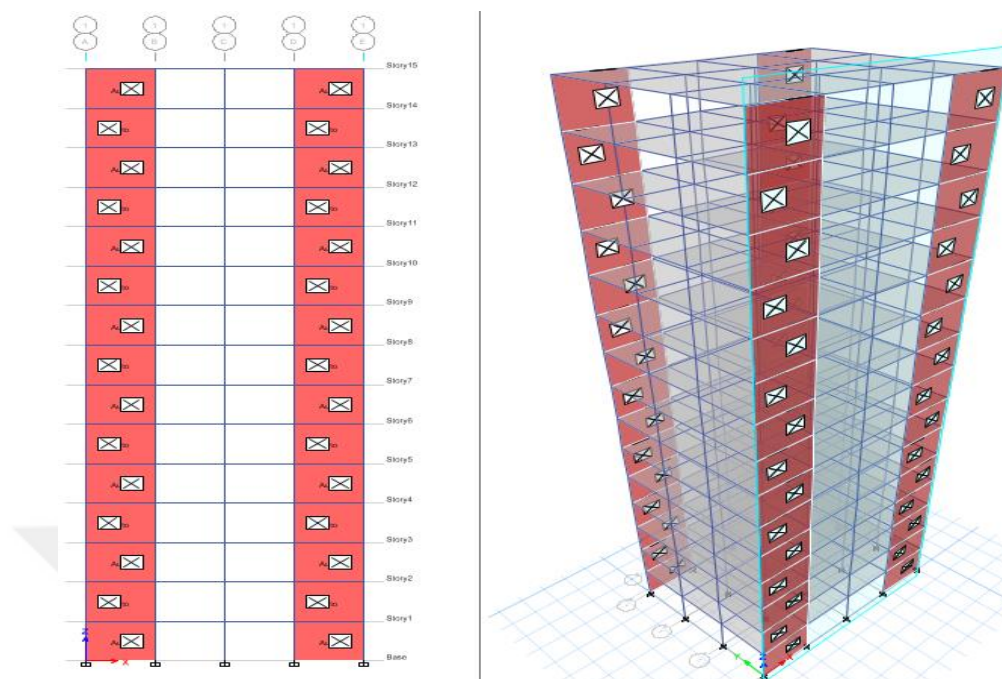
The 15-story building with concrete shear walls and with zigzag openings.
